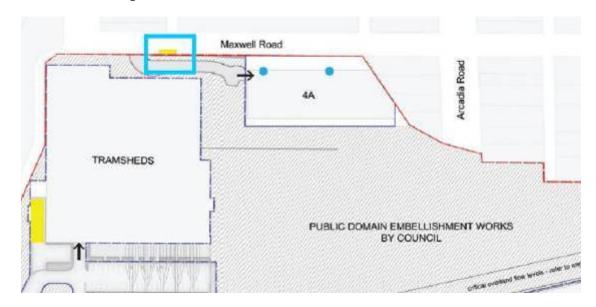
The proposed loading area on Maxwell Road to service Building 4A is shown boxed.
